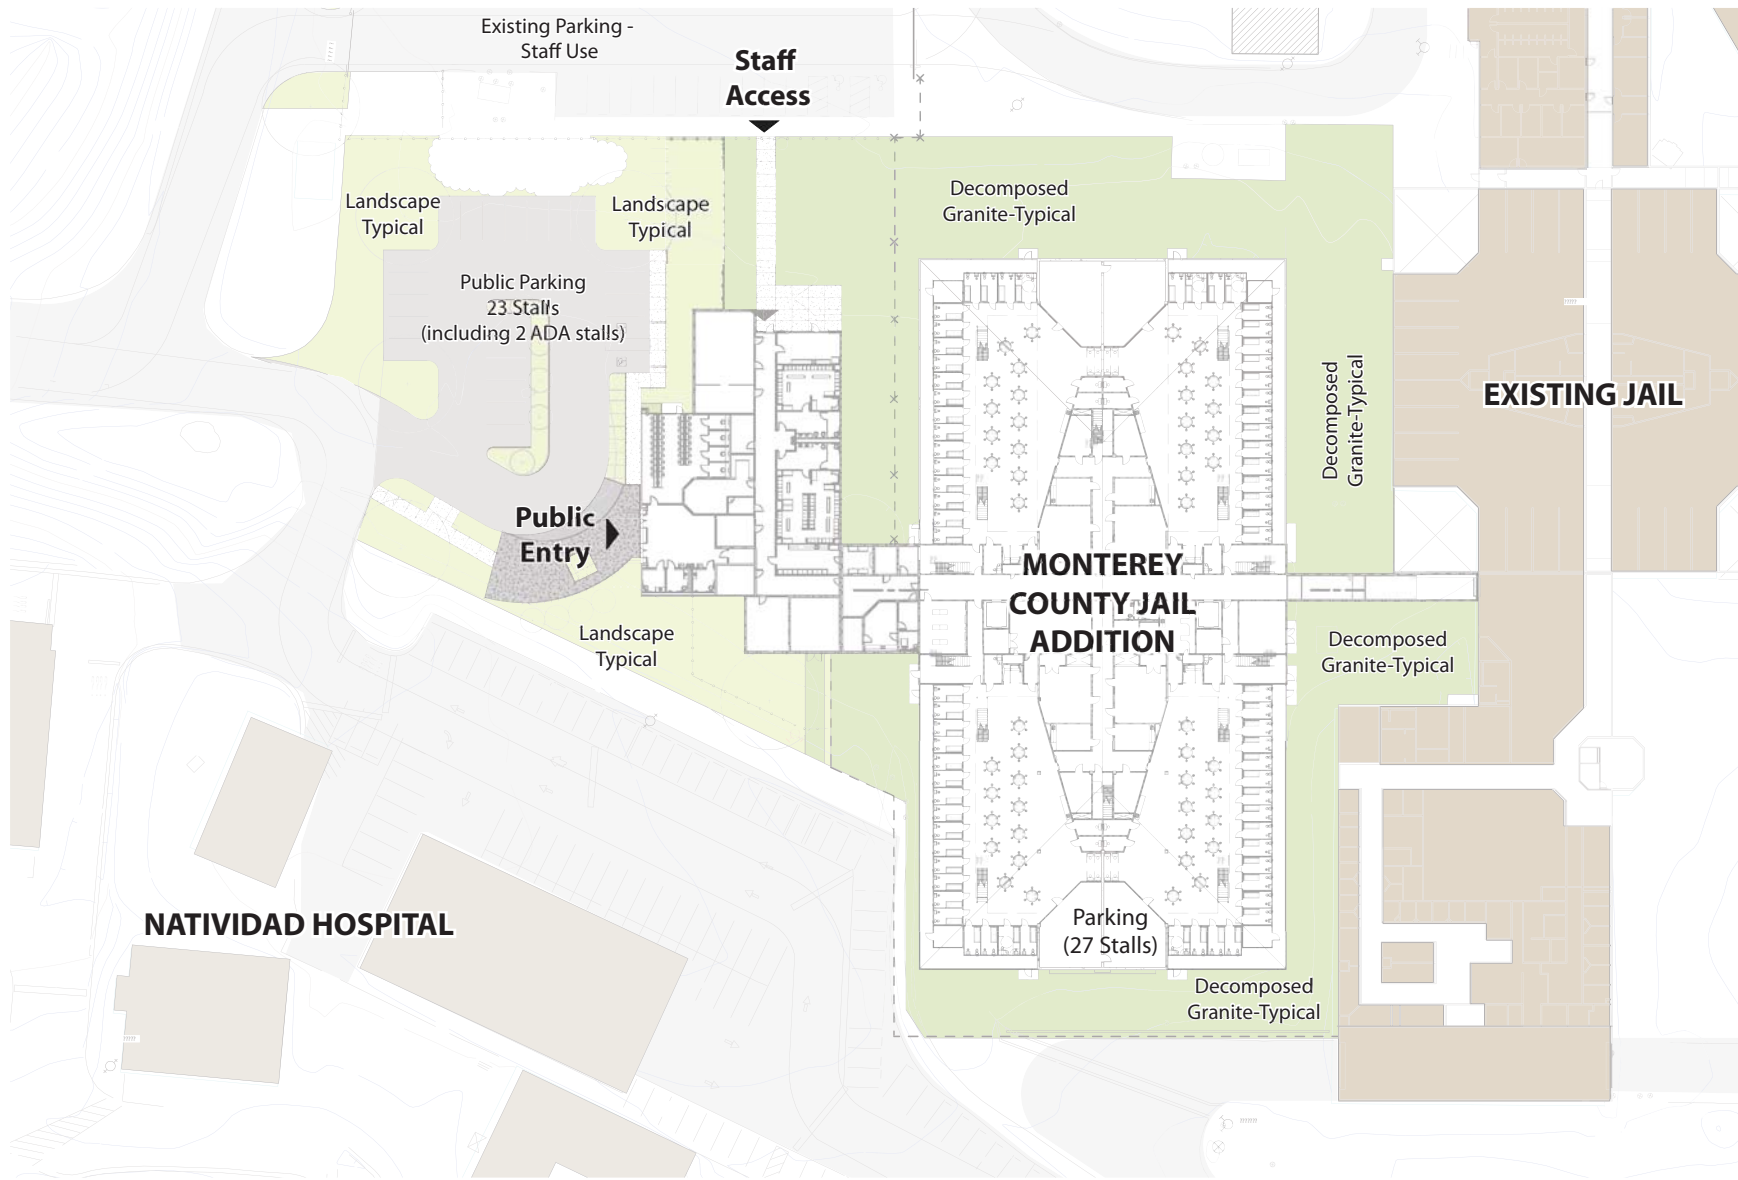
, Site Plan on page 2-15, and Figure 5, Site Plan – Aerial View on page 2-17 of the Draft EIR are revised to reflect current refinements to the project design including a small decrease in building footprint and re-orientation of the buildings on the project site as identified in the revised text above.
